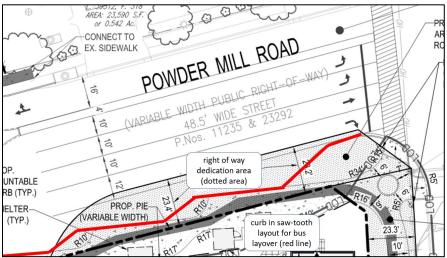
Powder Mill Road Curb Layout and Dedication Area
